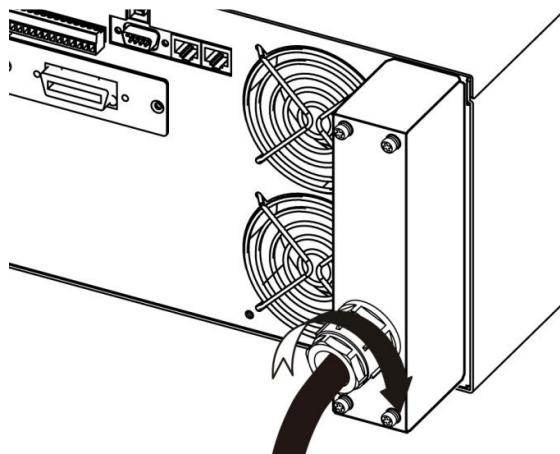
Assembling the 62050P Input Terminal Safety Cover - 4
